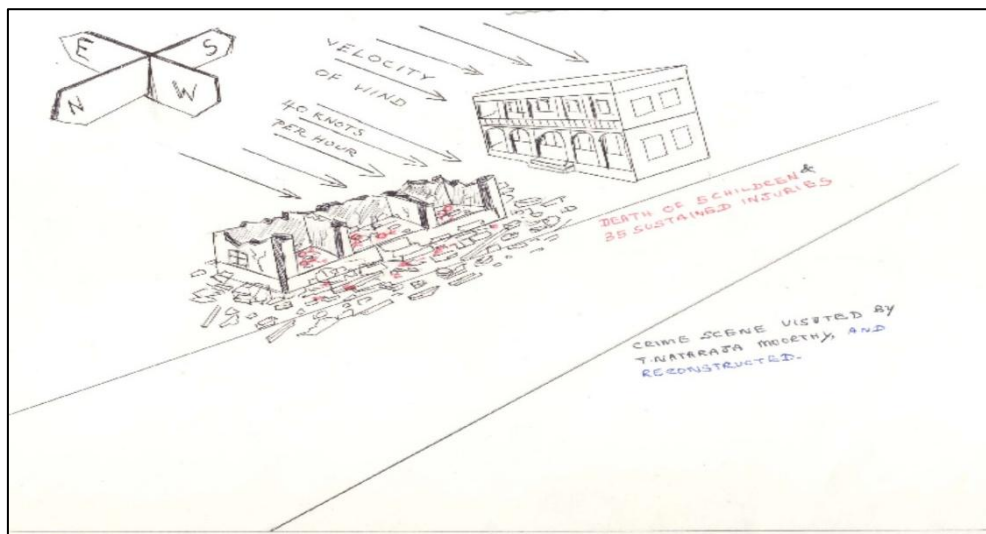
Sketch showing the collapsed school building block and intact building block near the high ways
